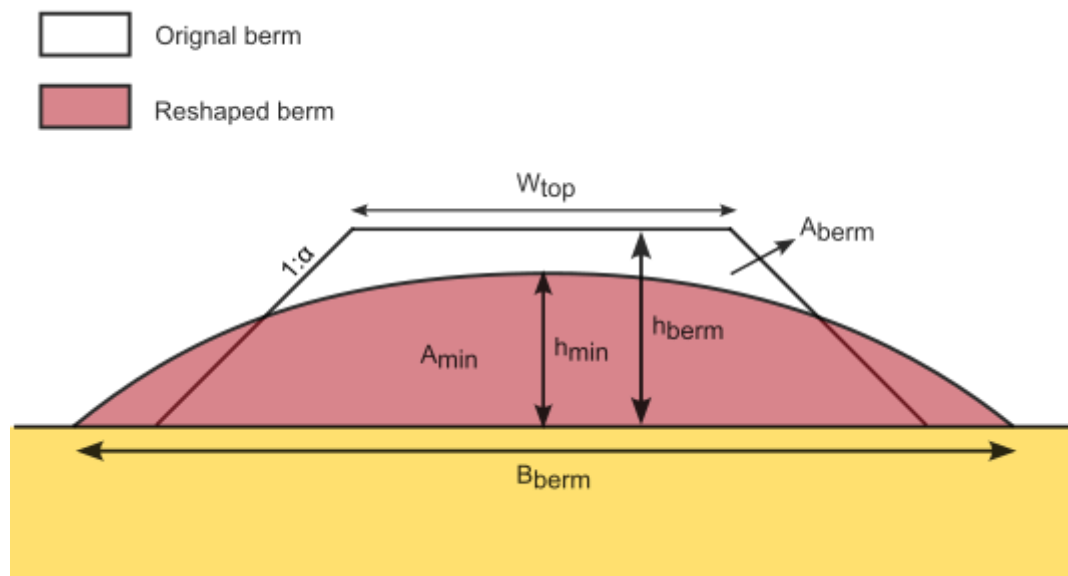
Definition sketch showing the installed rock berm profile and the reshaped rock berm profile.
